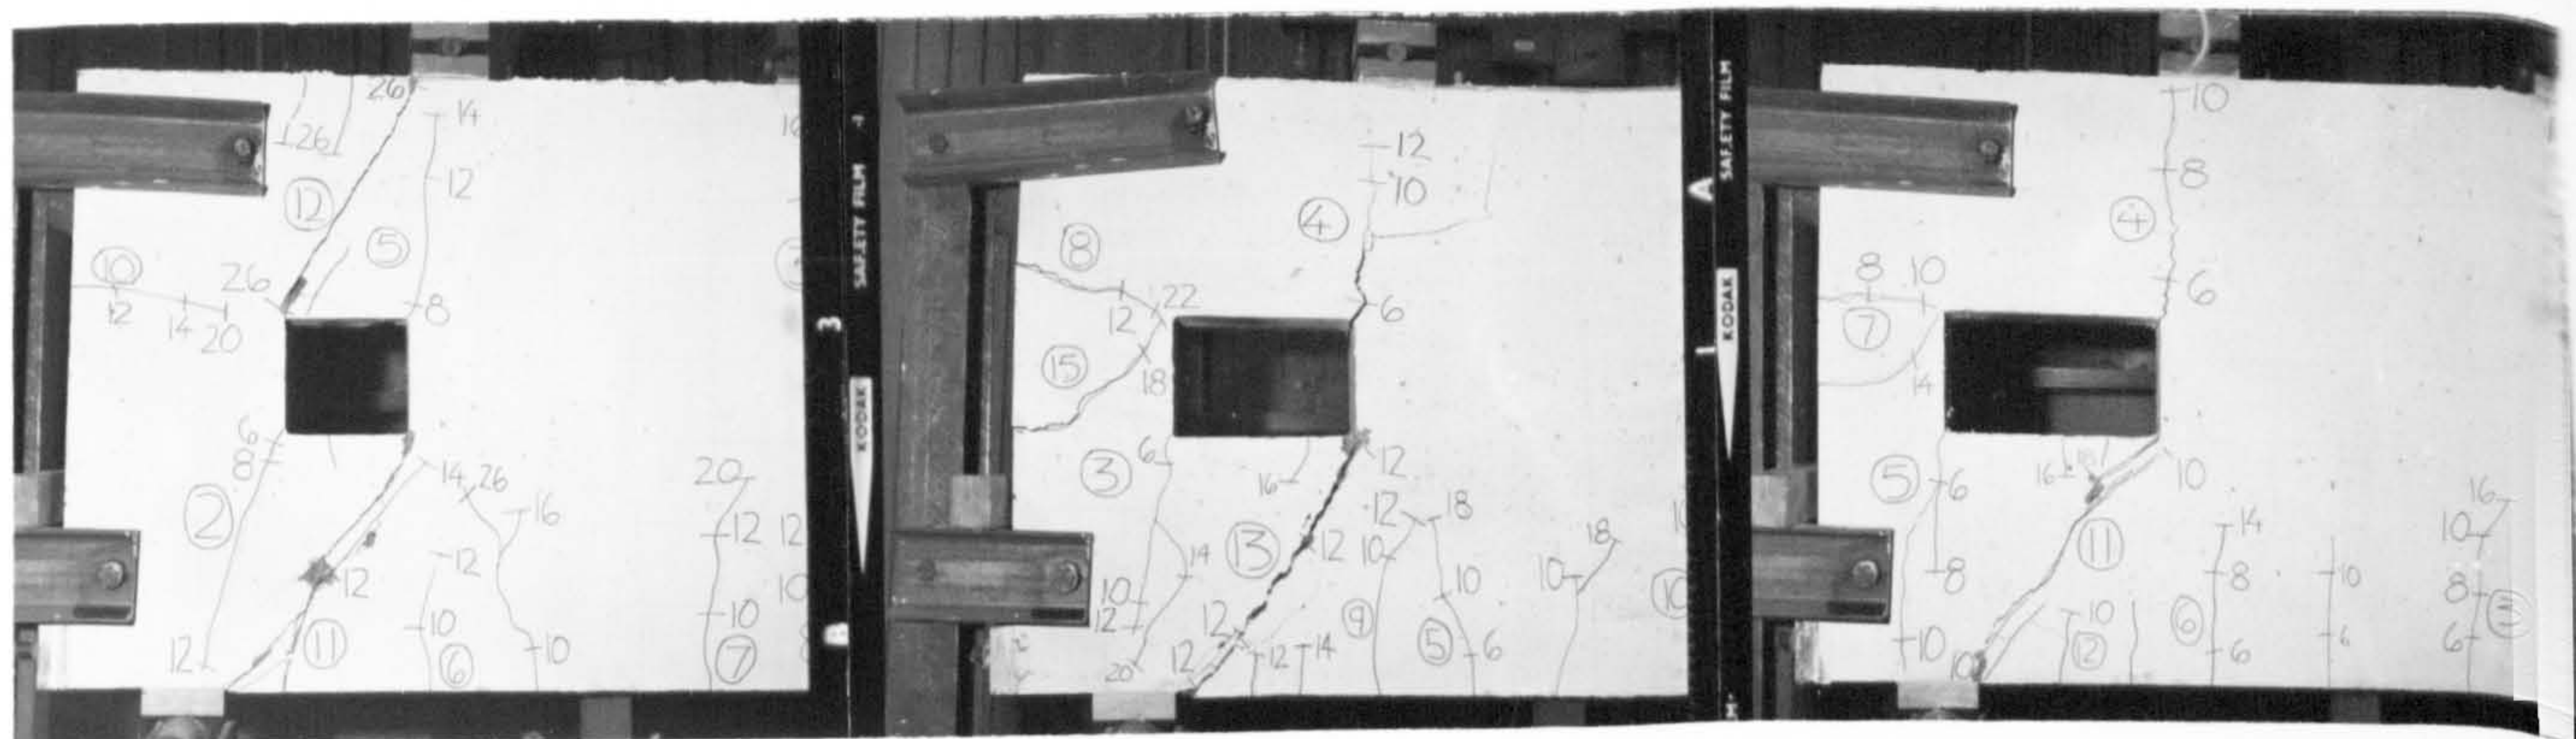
FOUR POINT LOADING - FOR BEAMS
